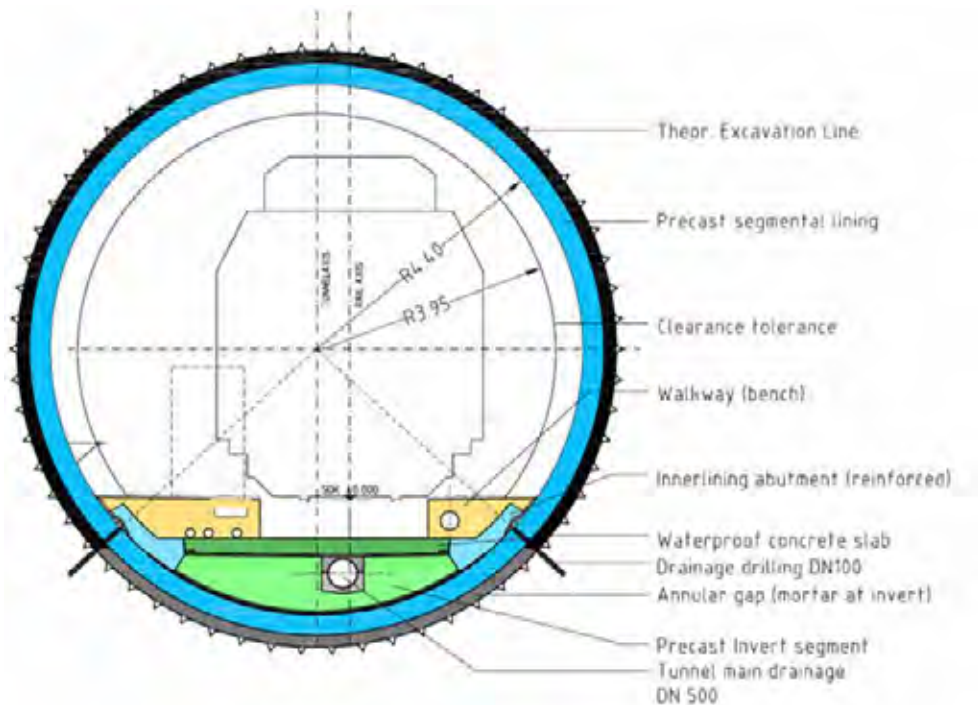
Simplified standard cross section for the Koralm tunnel (TBM section)
